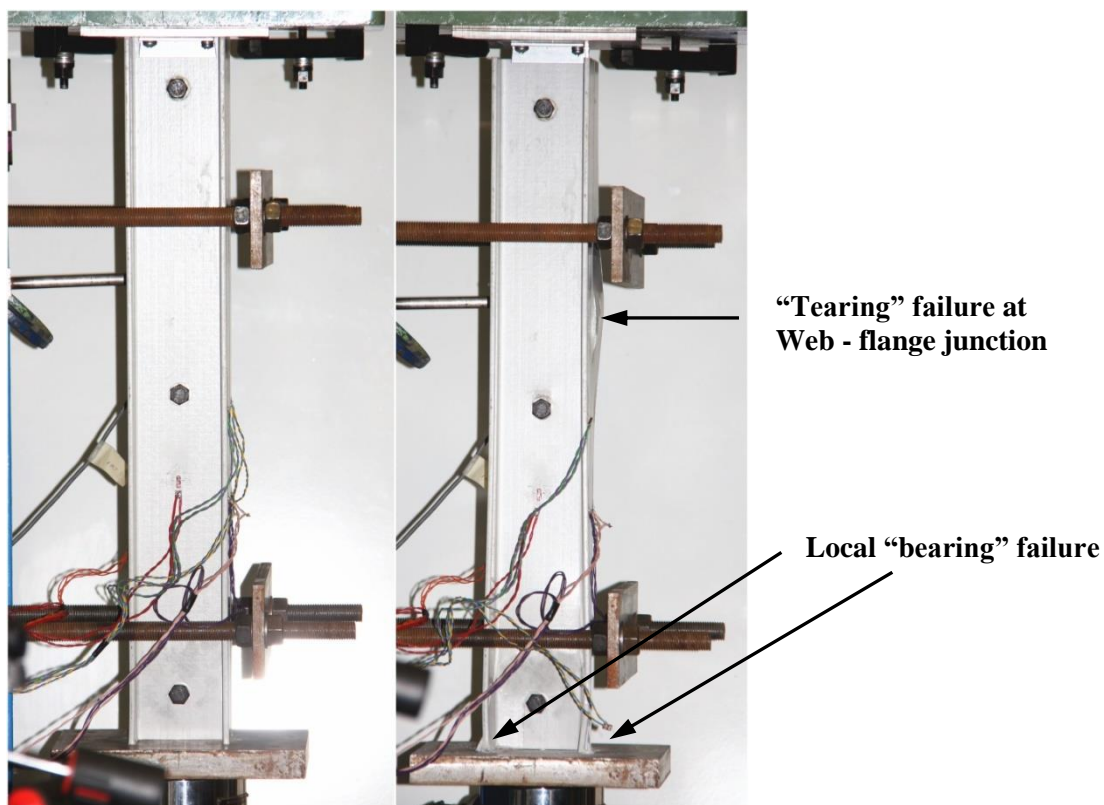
Local buckling test on C2 specimen: (a) under compression; (b) local buckling failure
